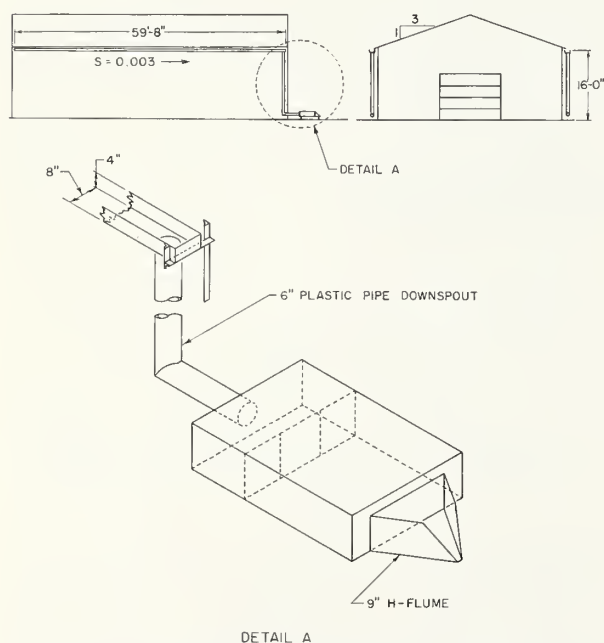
Roof-gutter and H-flume installation on model building.
